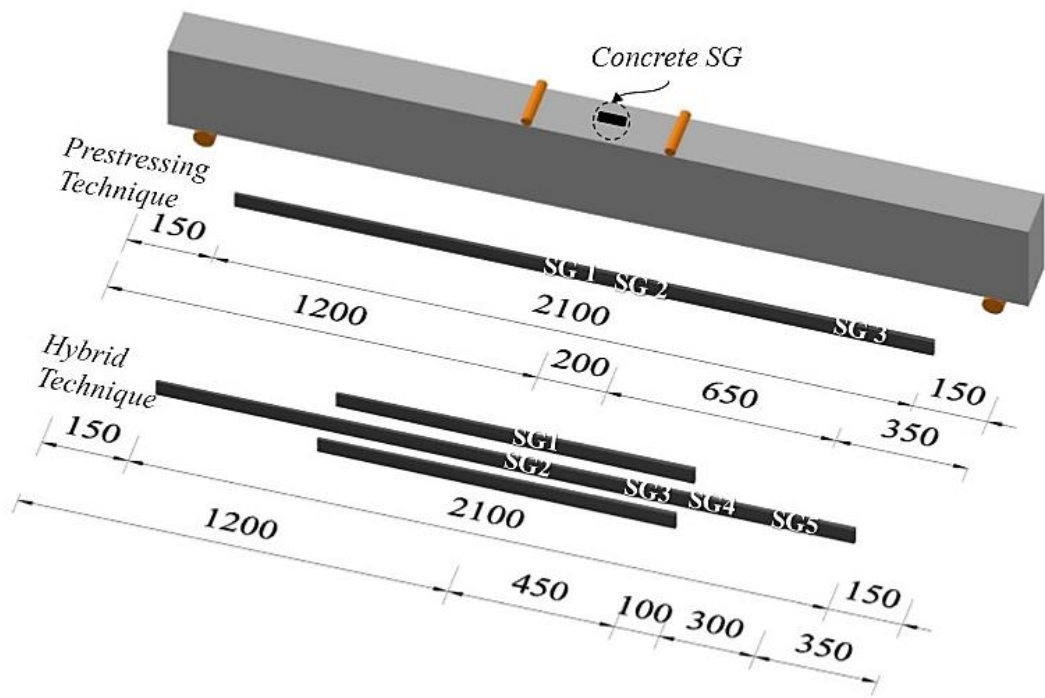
Position of the strain gauges (SG) installed on the CFRP laminates and concrete (dimensions in mm)
